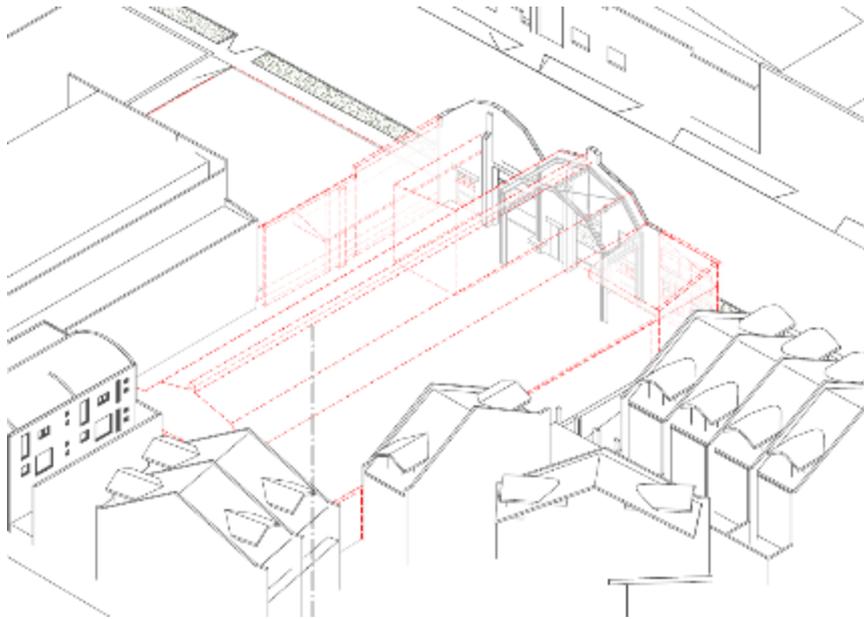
3D drawing showing proposed demolition and elements to be retained
